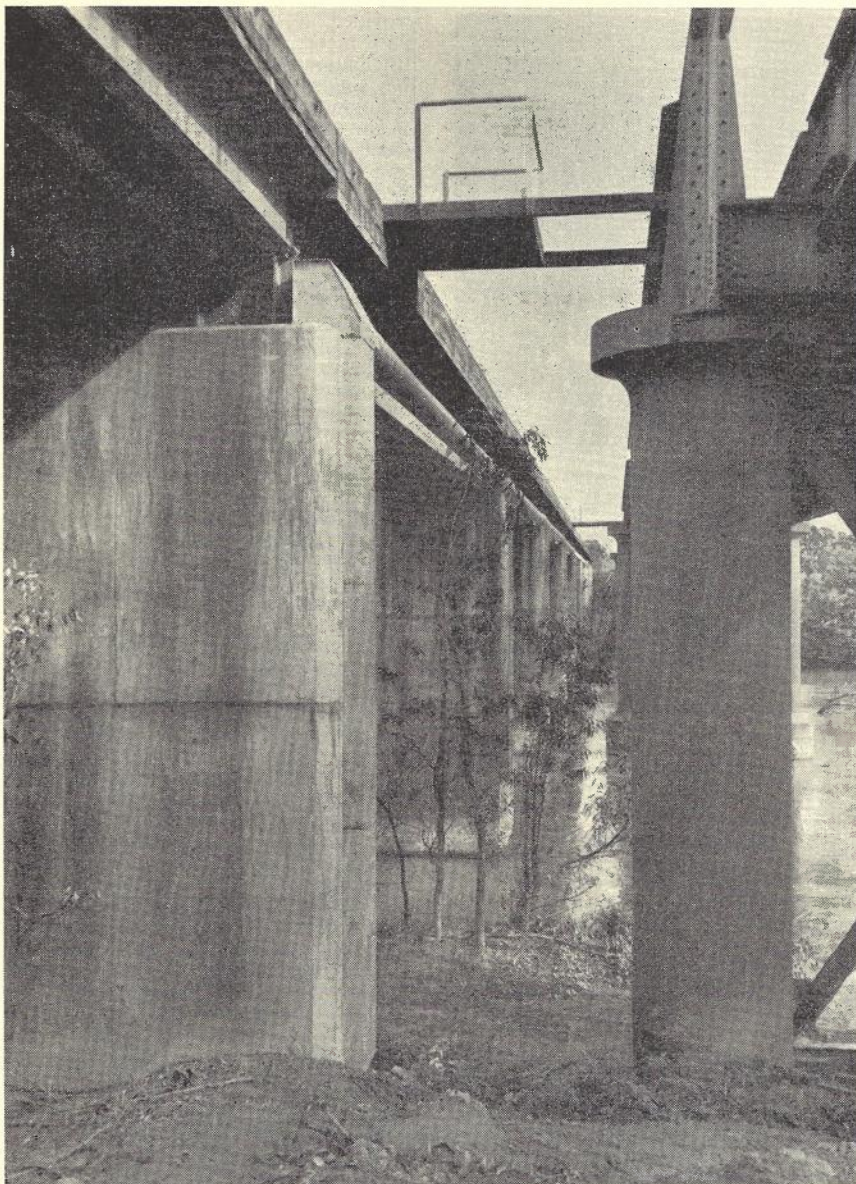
Pipe Crossing on Railway Bridge over Goulburn River at Seymour.
